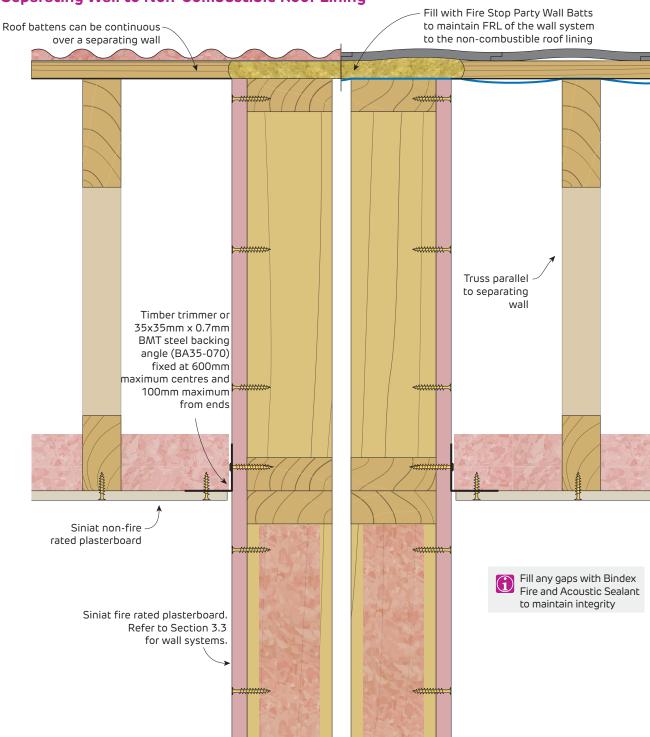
Separating Wall to Non-combustible Roof Lining $\mbox{FRL}\,60/60/60$
